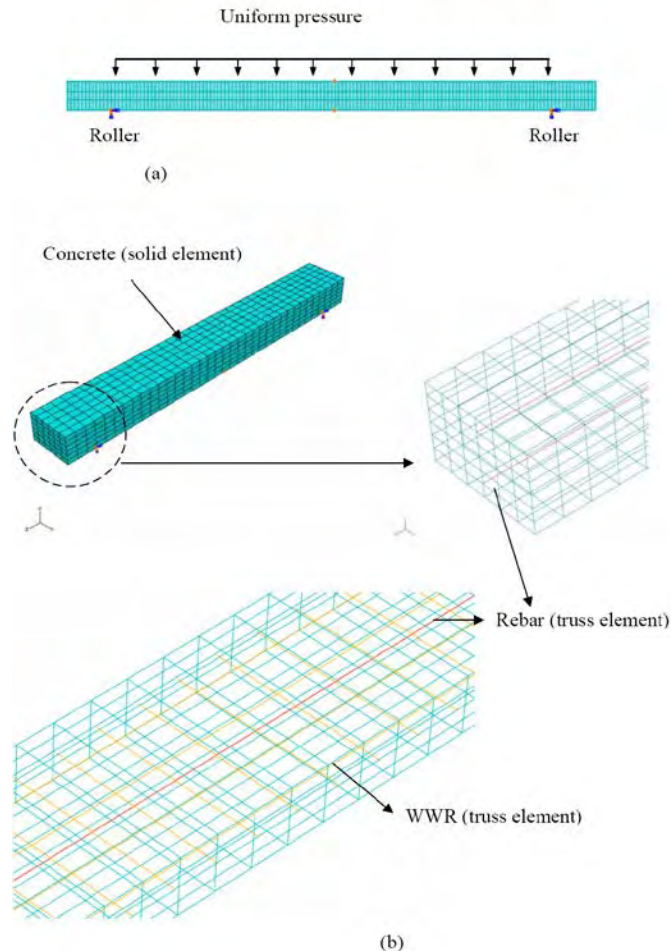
FE Models: (a) Loading and Boundary Conditions and (b) Concrete, Rebar and WWR Elements
